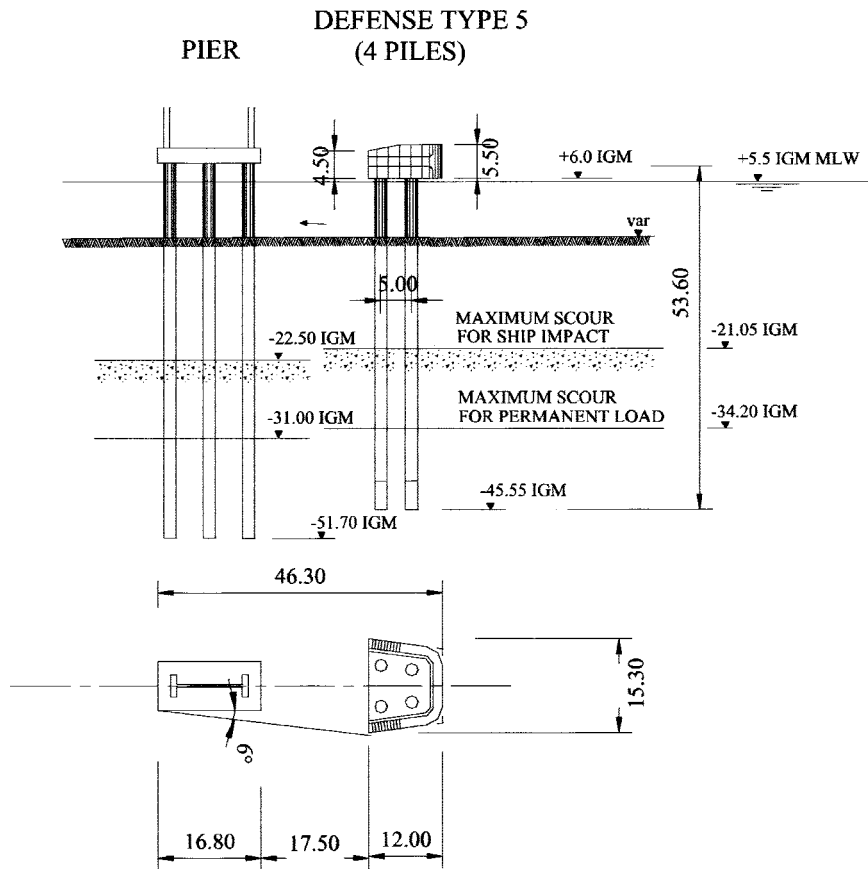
Typical protection structure with four piles for piers of access viaduct
